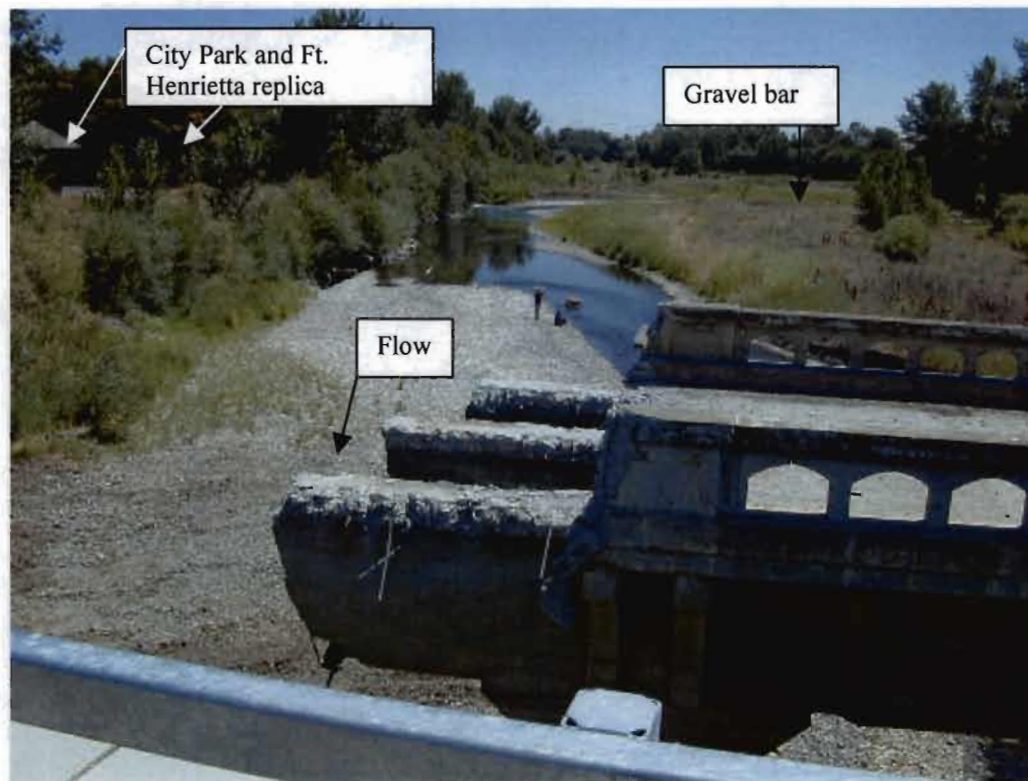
View looks upstream (south) at old county road bridge being destroyed and gravel bar buildup west of town. Taken from new bridge.
